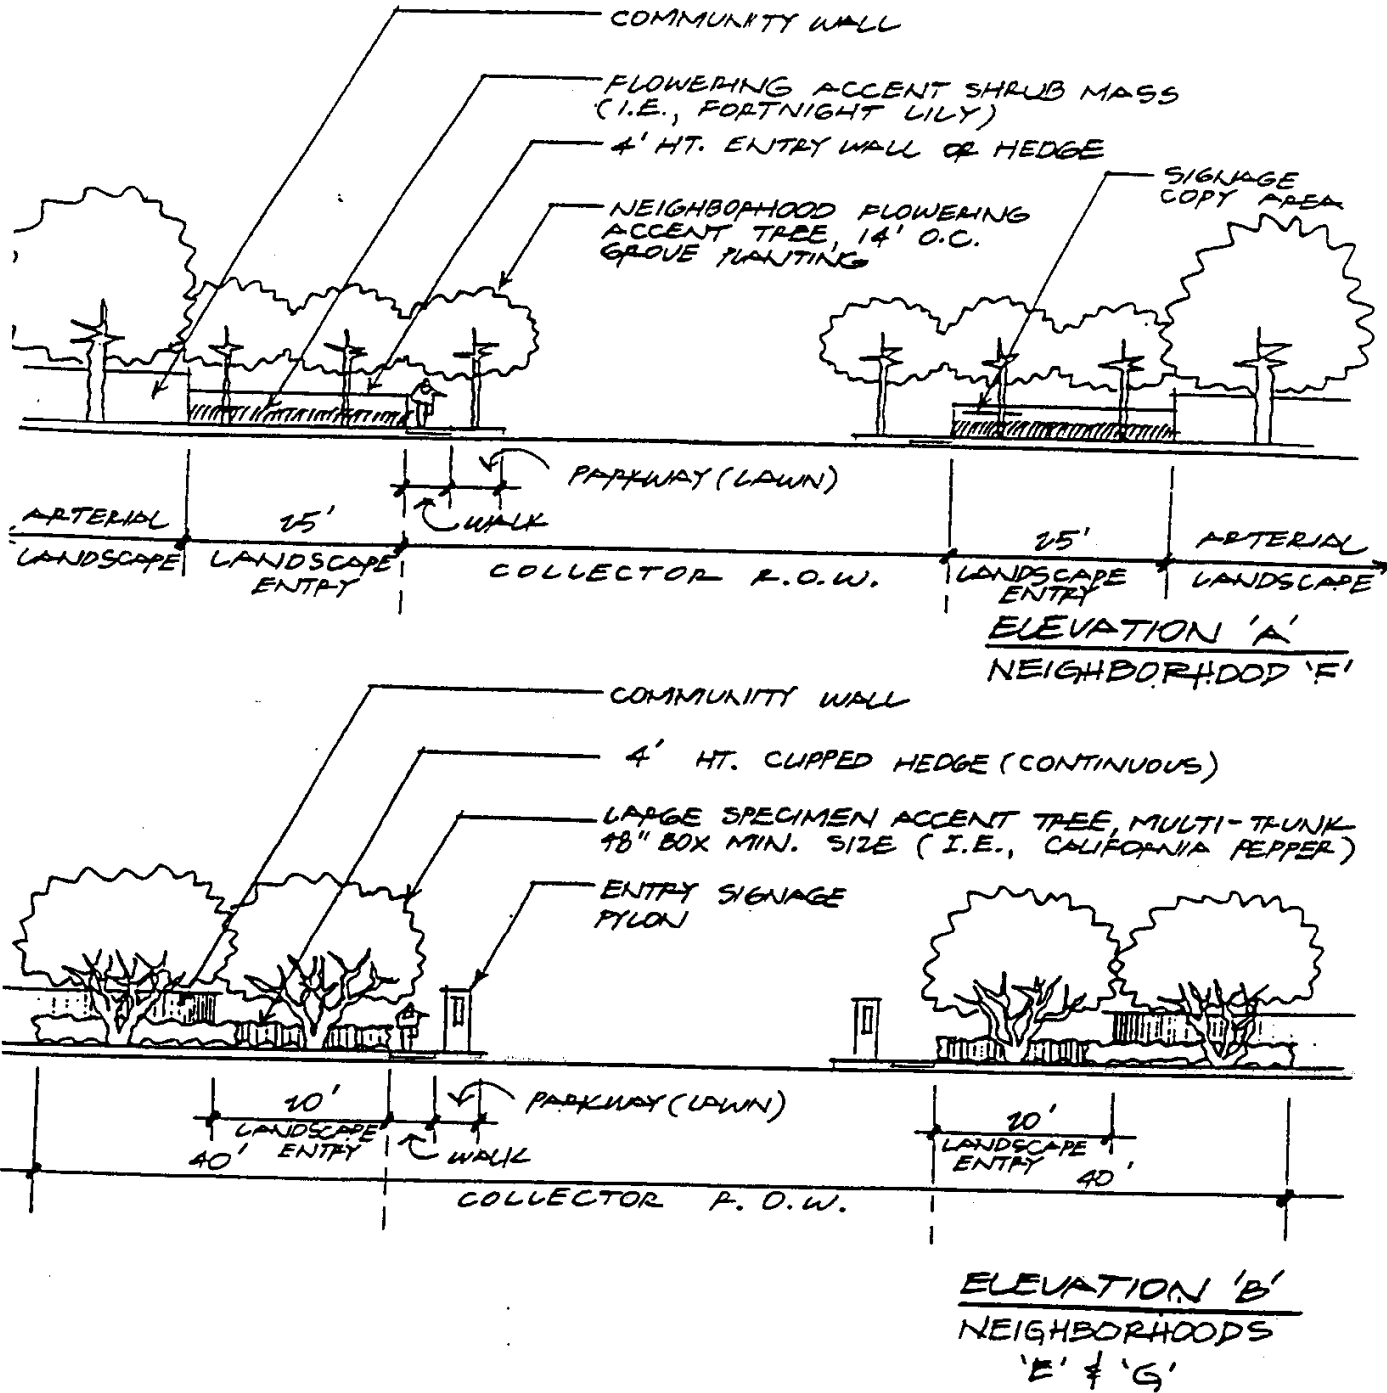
TYPICAL NEIGHBORHOOD E, F AND G ENTRY ELEVATION
